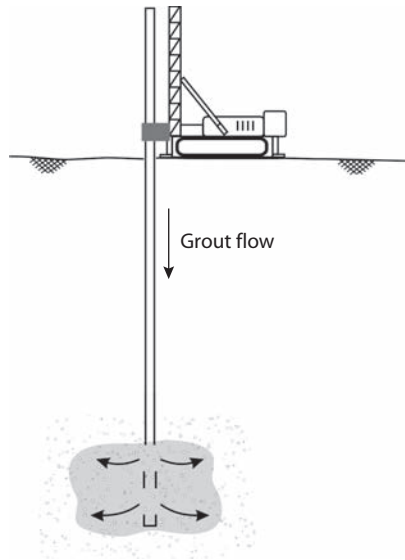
Permeation grouting. Liquid grout is injected at a steady pressure, without disturbing soil structure, to fill or partially fill the soil pore spaces.
